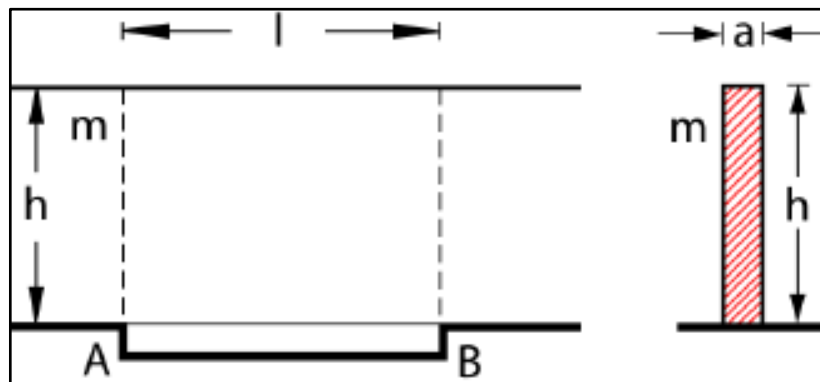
Example of “central” settlement of a masonry wall (modified by Anzani et al., 2008).
